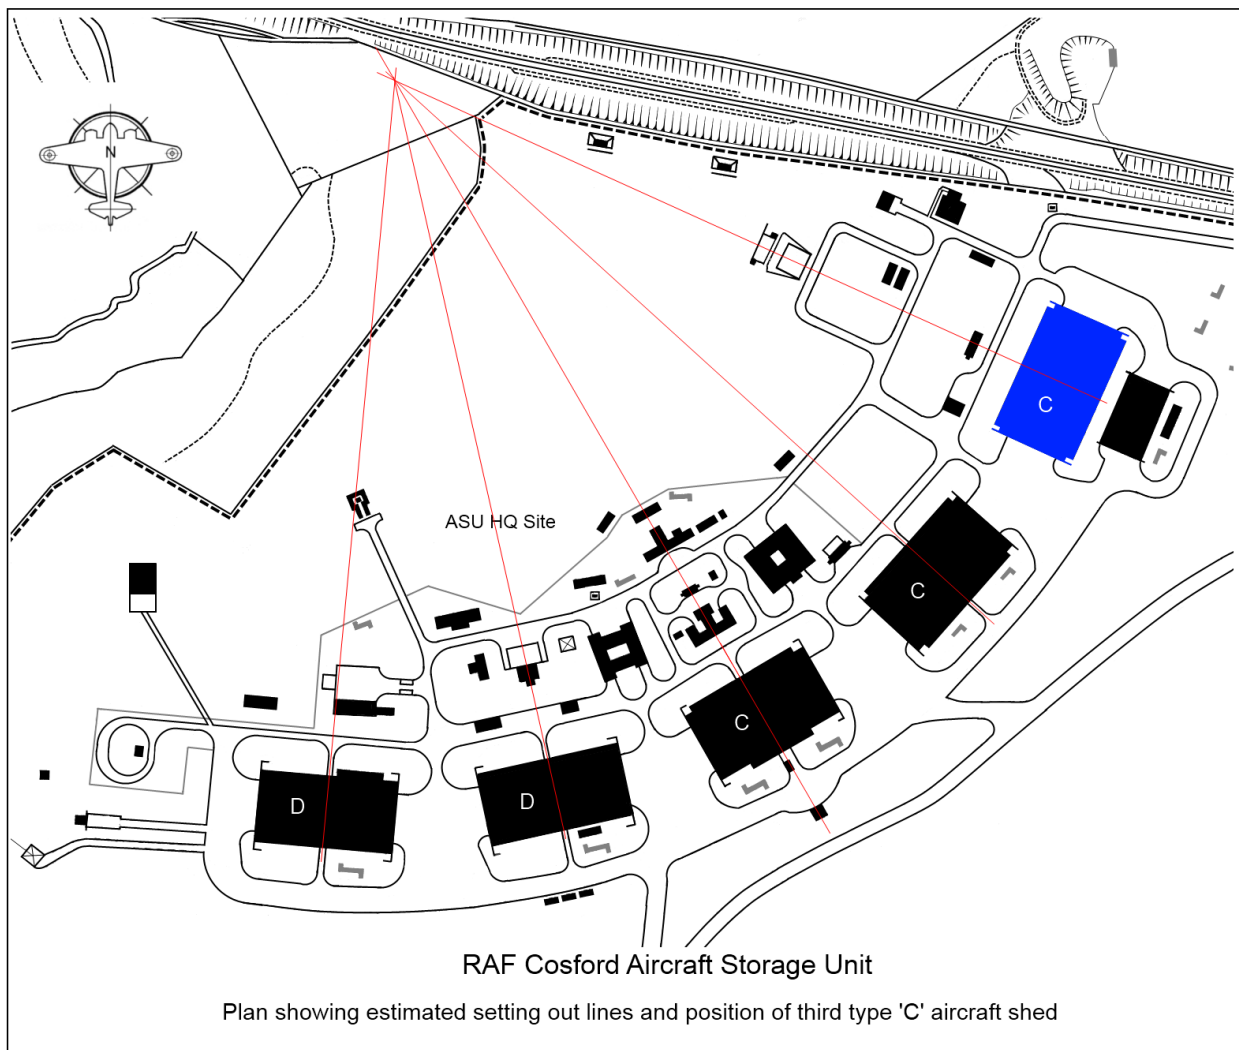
Main Site plan showing the type 'C' aircraft sheds
